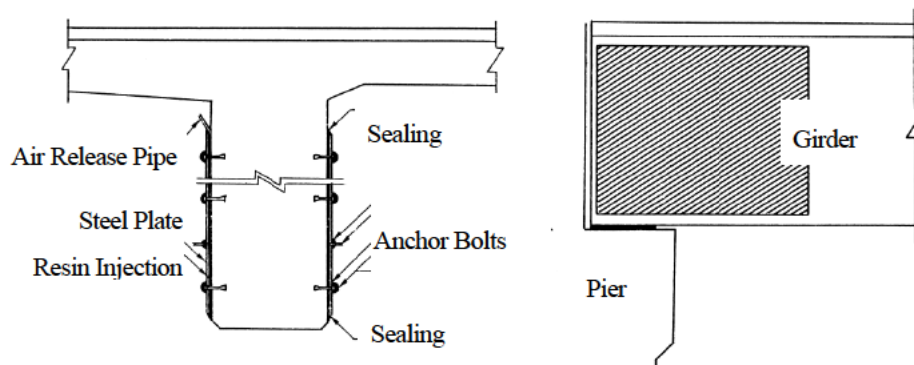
Steel Plate Attaching Method for Concrete Girder
